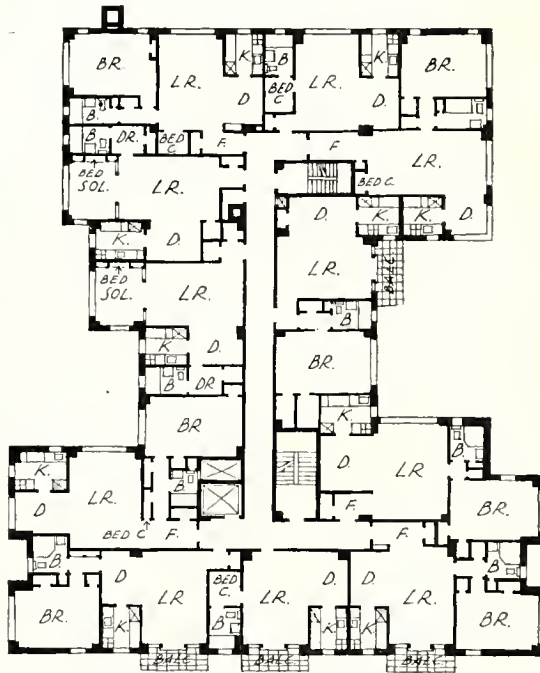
Apartment building at 2407 Fifteenth Street, Washington, D. C. John J. McInerney, owner and builder; Joseph H. Abel, architect. An example of a building in Type 2, located in a good residential district and across from a large public park. The balconies have a pleasant view across the park. Apartment units are mostly of the housekeeping type with a few efficiency units.
